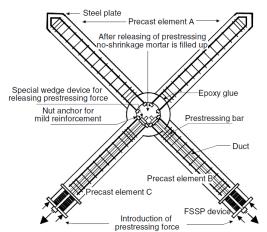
Lateral force resisting mechanism and design items and its reinforcement
